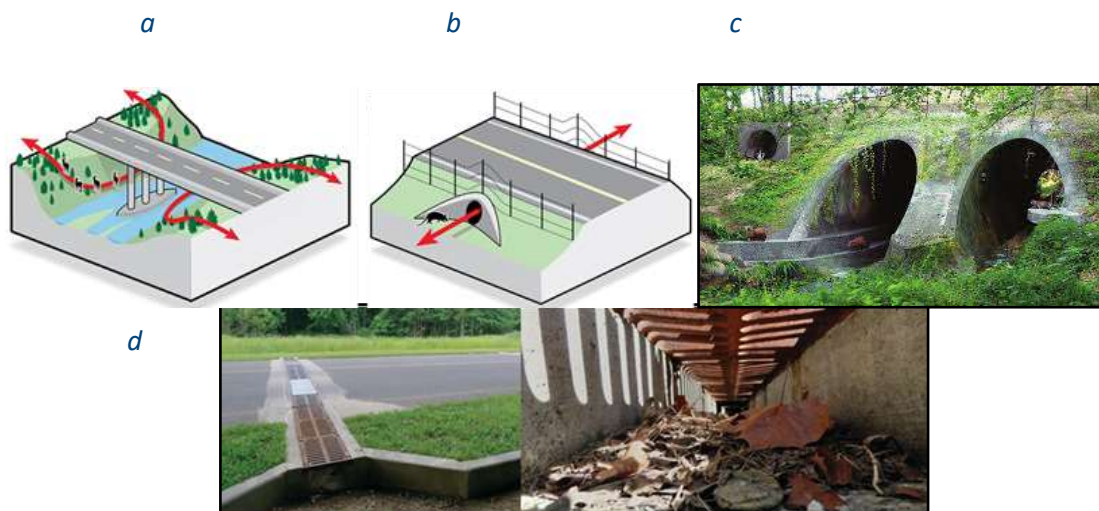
Examples of providing links – (a) adapted viaduct (source: [18]); (b) adapted culvert (source: [18]); (c) dry pipe, dry ledge and dry shelf inside the bridge (from left to right in the photograph; source: [19]) and (d) amphibian (salamander) passage (source: [20]).
